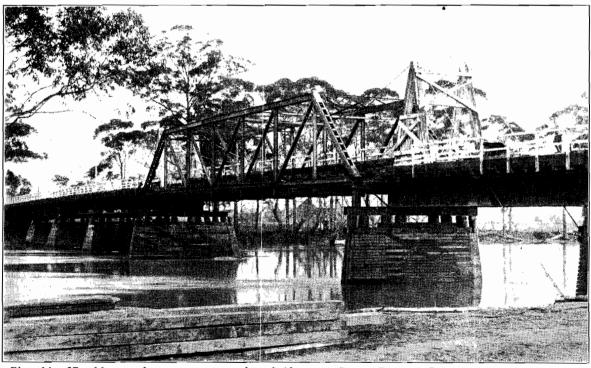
New steel truss span erected on bridge over Snowy River at Orbost in place of two spans destroyed by floods.
